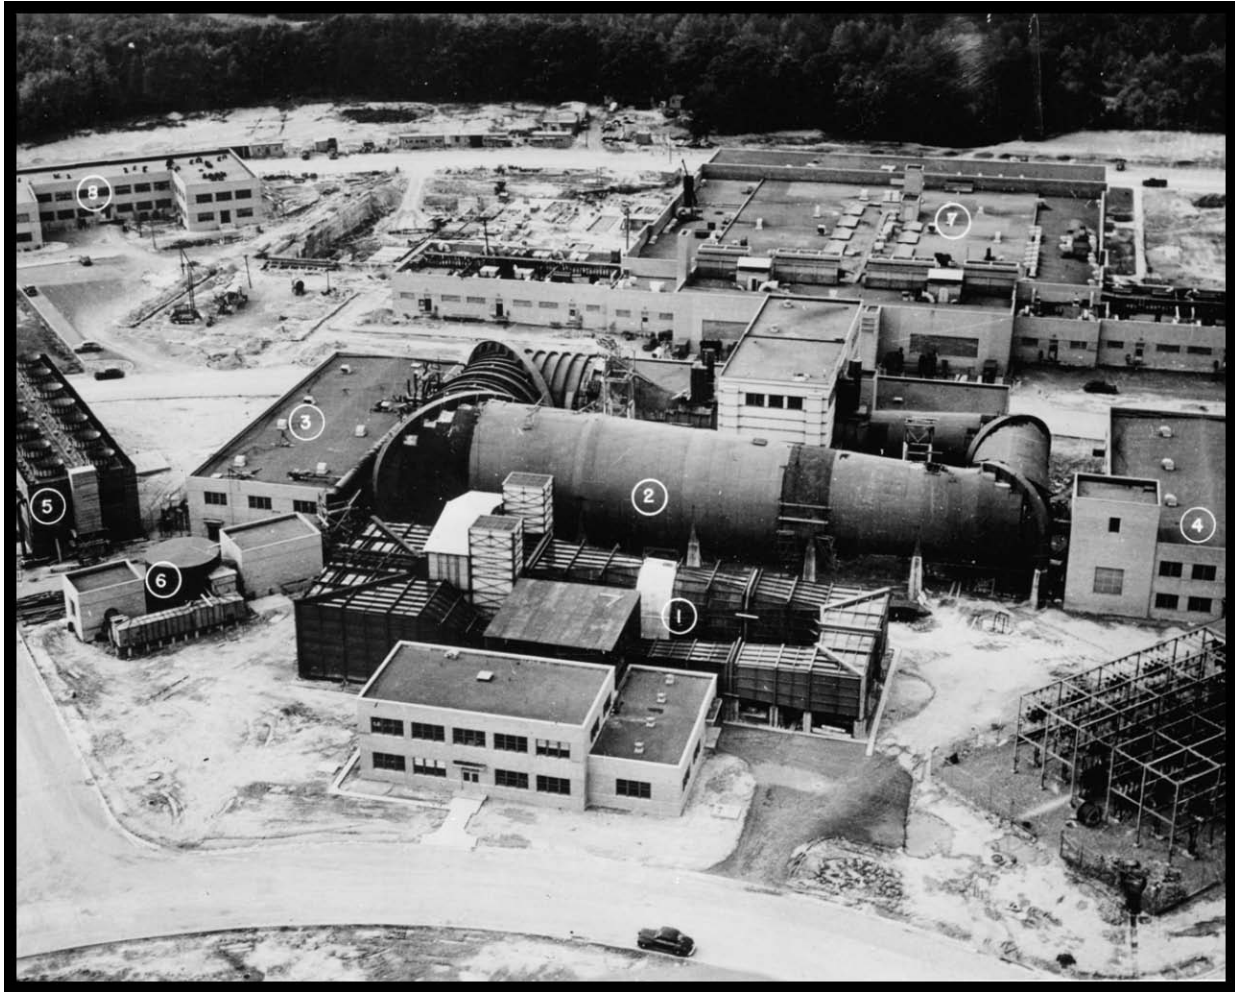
Buildings in the vicinity of the AWT, 1944. (1) Icing Research Tunnel, (2) AWT, (3) Refrigeration Building, (4) Exhauster Building, (5) Cooling Tower No. 1, (6) Air Dryer Building (OH_Cuyahoga_Altitude-Wind-Tunnel_007).
